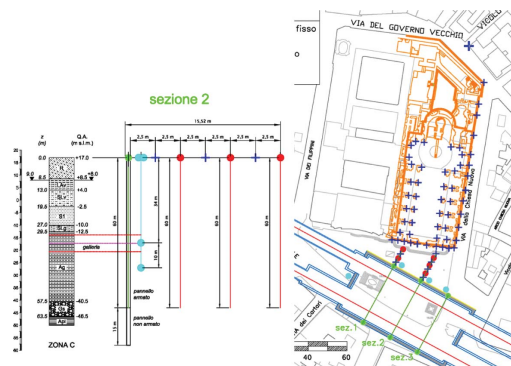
Proposed layout of instrumentation at Chiesa Nuova Station (courtesy of Metro C spa).
